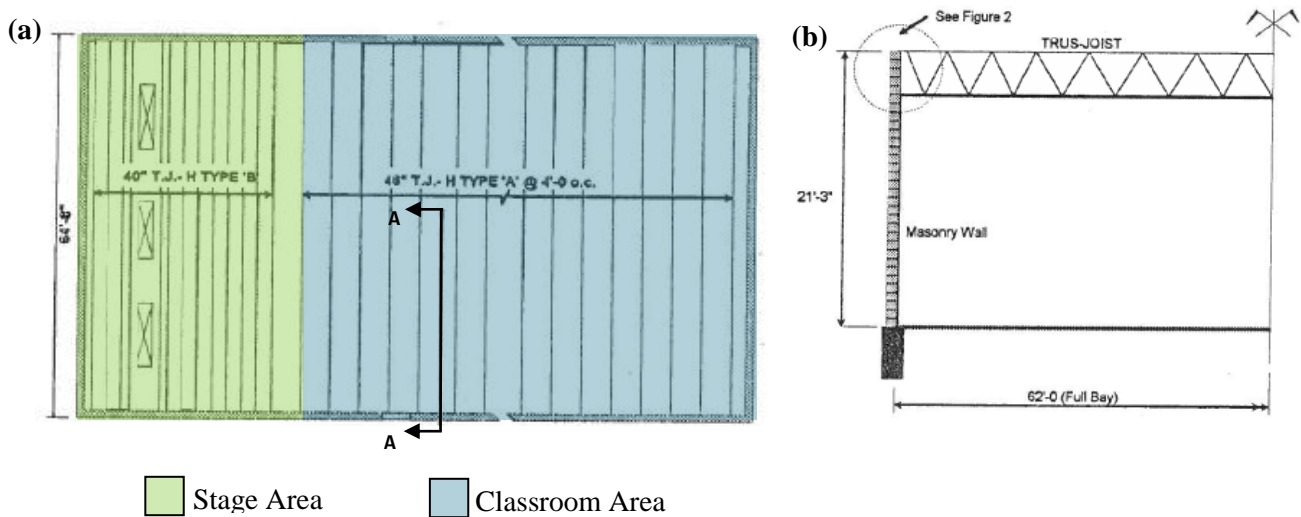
(a) Plan view and (b) elevation view (section A-A) of the Fine Arts building. The elevation view shown in (b) continues along the entire width of the building and is mirrored on the other side (J.R. Harris & Co. 2011).
